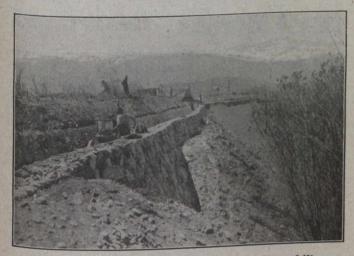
Showing Retaining Wall on Downhill Side of Canal
